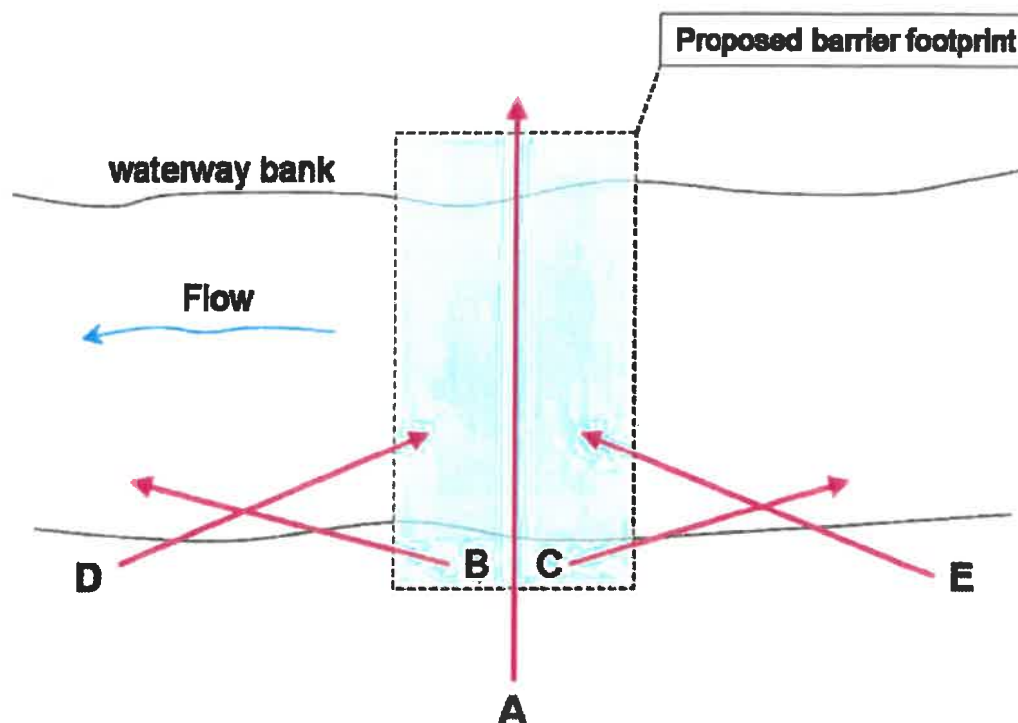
Generalised plan view of a site showing the location of photos to be taken for pre- and post-works notification
